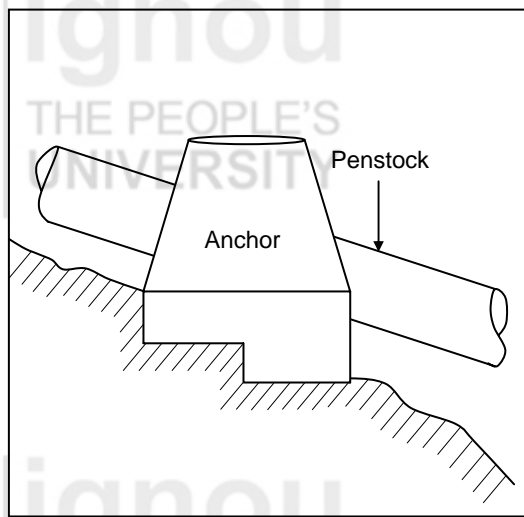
A Serrated Surface Ensures Proper Key between Anchor and Foundation (Penstock)
